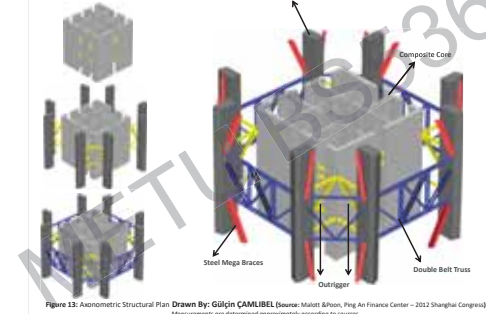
Anomeric Structural Plan Drawn By: Gülçin ÇAMLİBEL (Source: Malhot Bhoon, Ping An Finance Center - 2012 Shanghai Congress) Measurements are determined approximately according to sources.
